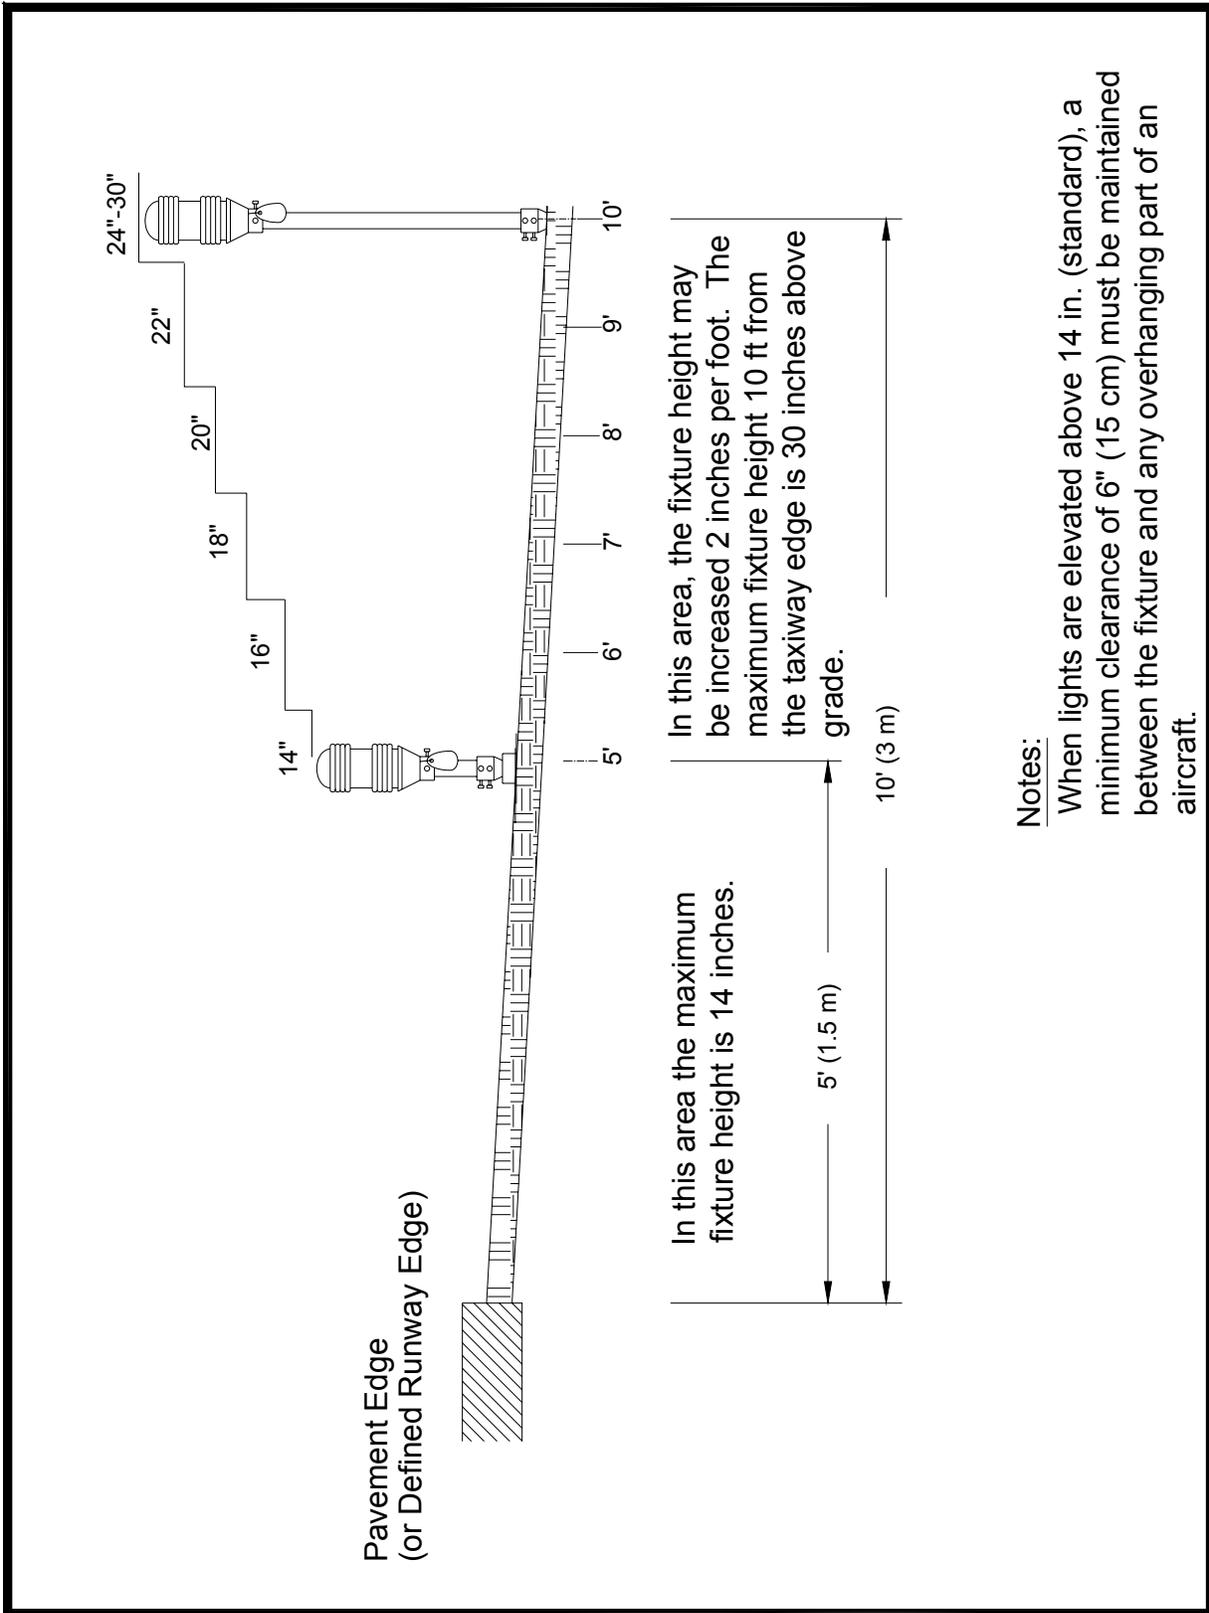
Adjustment of Edge Light Elevation for High Snowfall Areas
